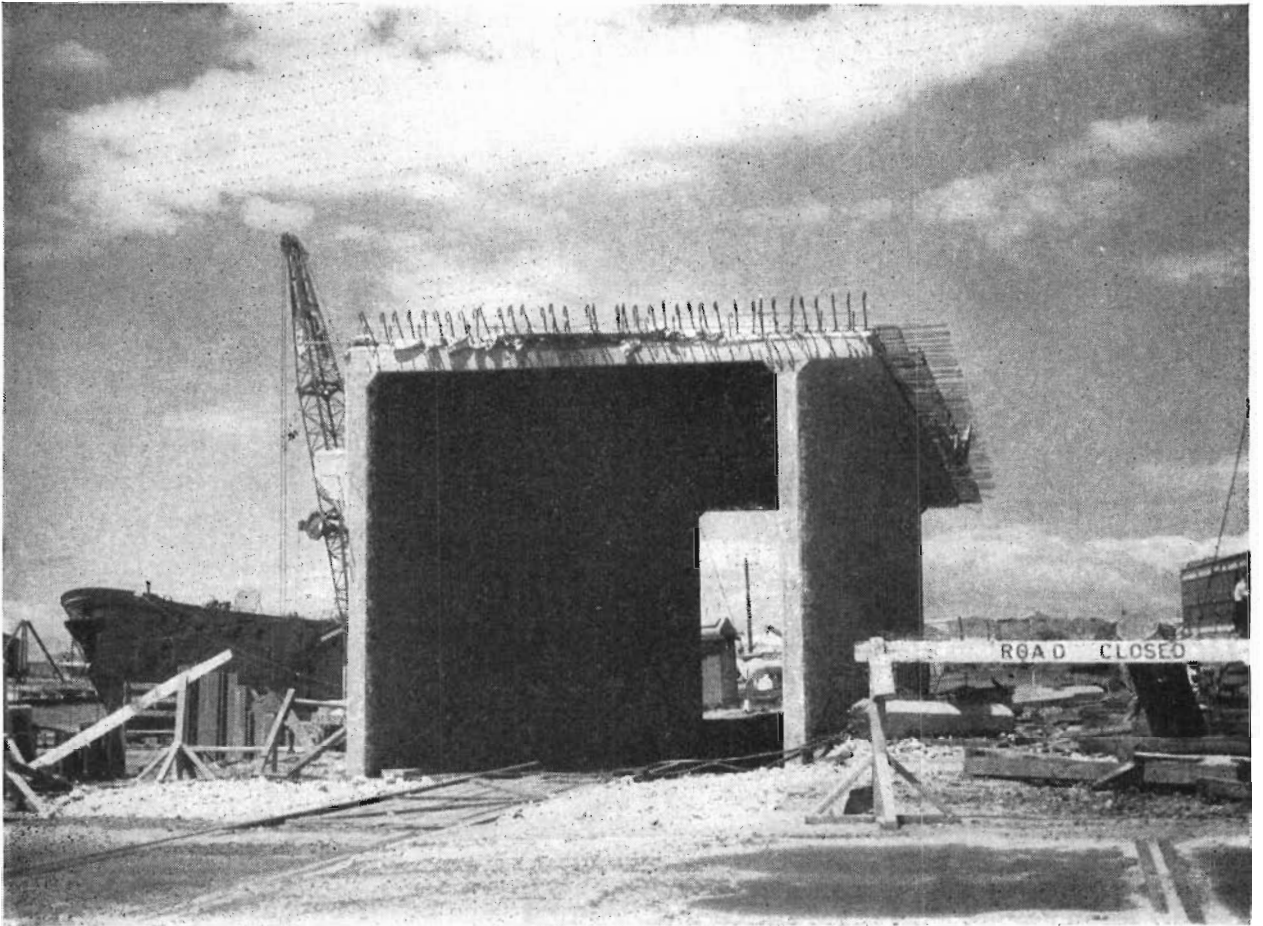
Napier Street Bridge over Maribyrnong River, Cities of Melbourne and Footscray. Section over railway at Footscray end of bridge.
